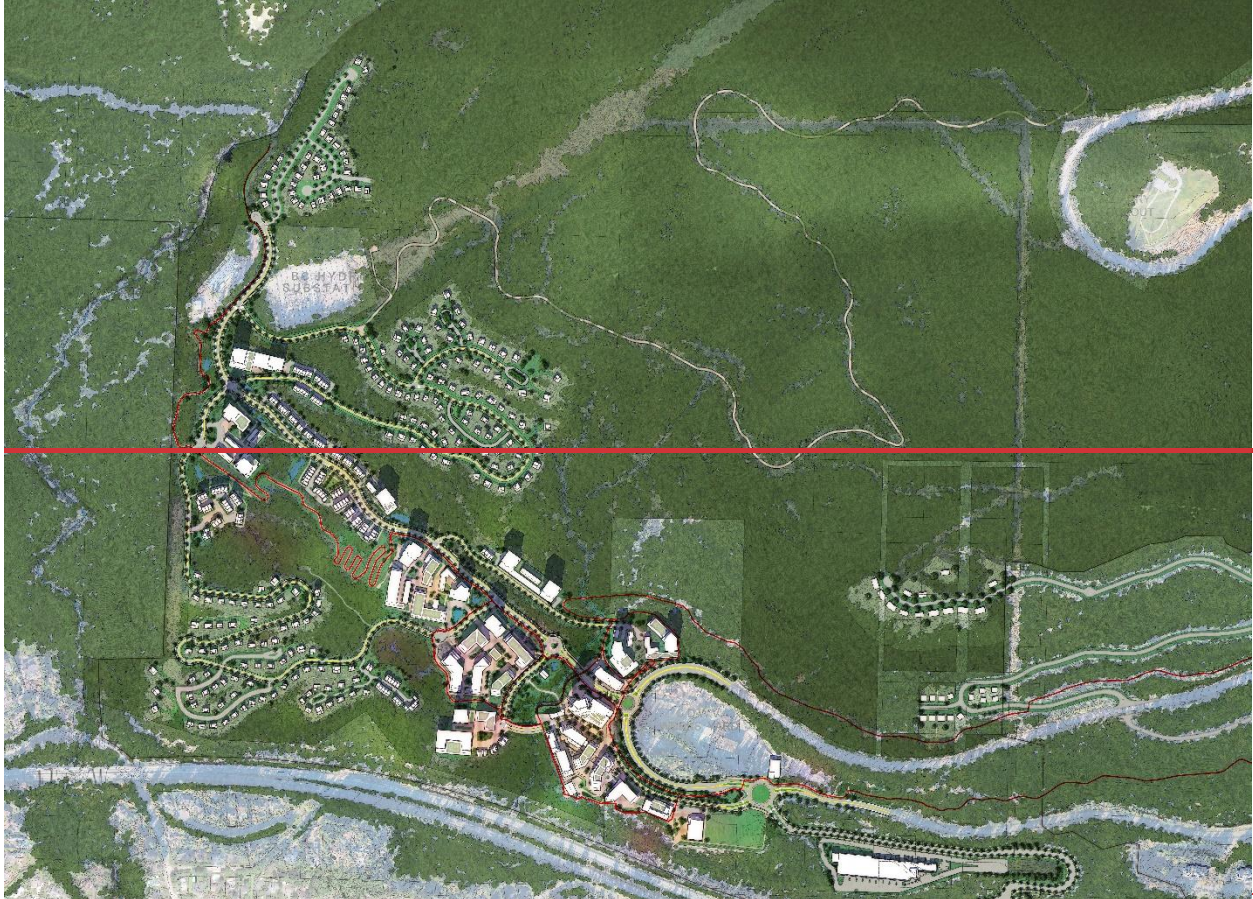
T: Concept Plan and Artist's Illustration of Cypress Village Upon Build-Out
